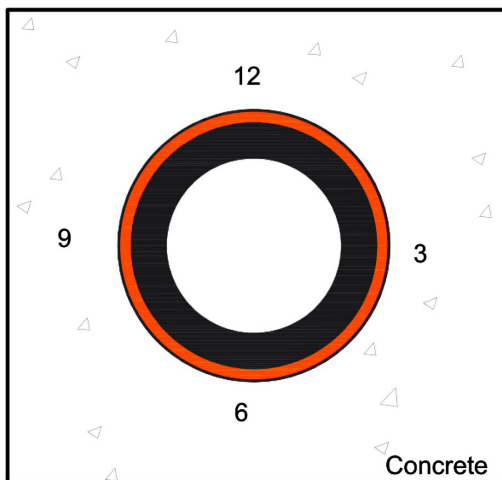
Front view - pipe penetration through vertical concrete wall.
